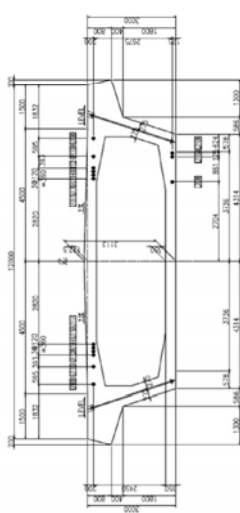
Cross-section of PC-Girder with PC-bars inside Web
